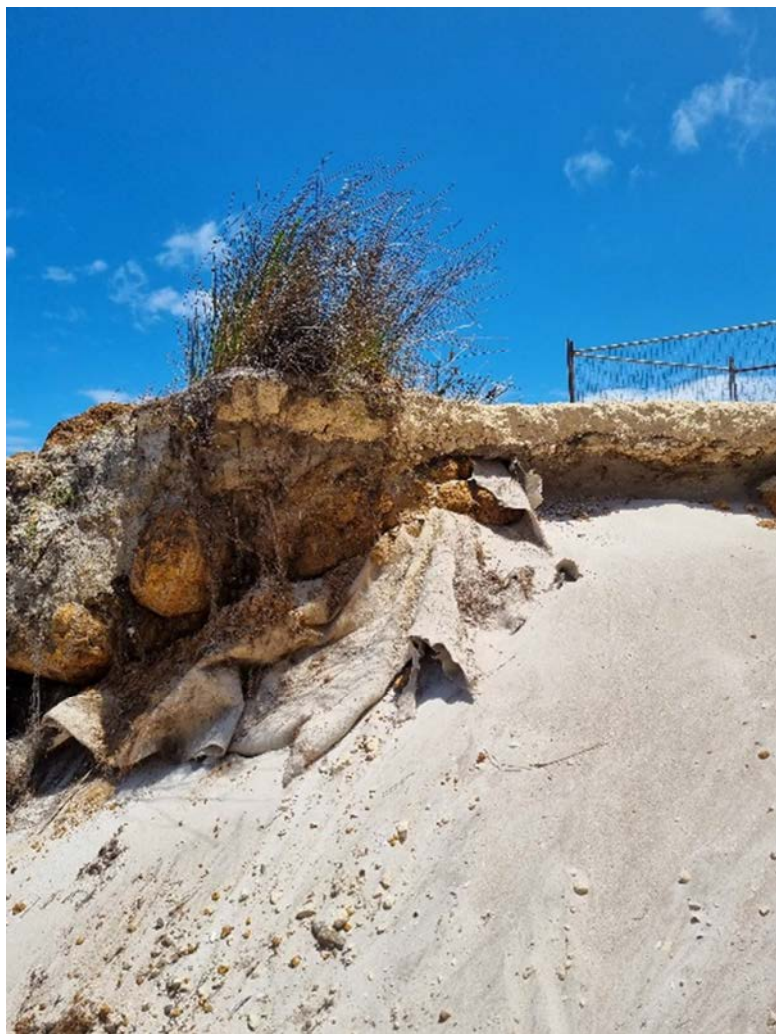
Damaged seawall with slope failure and geotextile exposed (~+475m), taken during site visit 5 December 2024.
